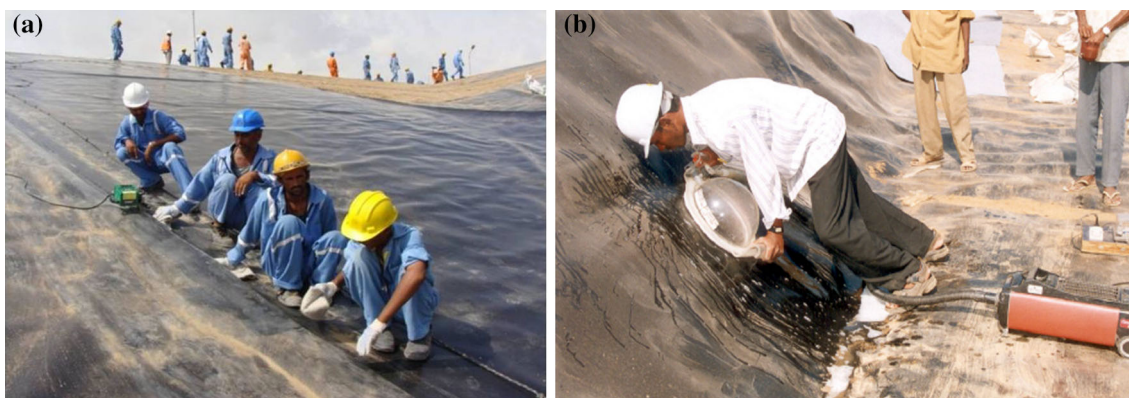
Installation of geomembrane on the landfill at HZL plant. a Hot wedge welding, b vacuum testing of the weld quality
